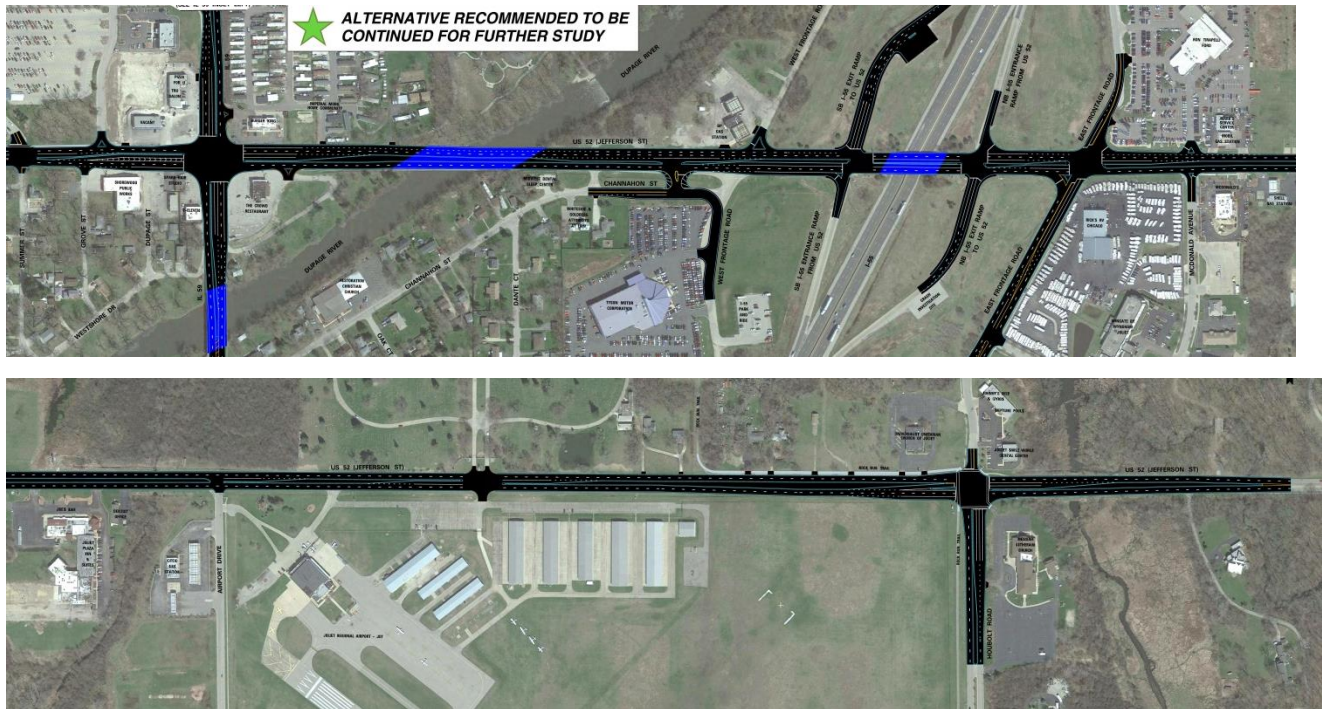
US 52 Alternative IL 59 to Houbolt Road Concept Plan
